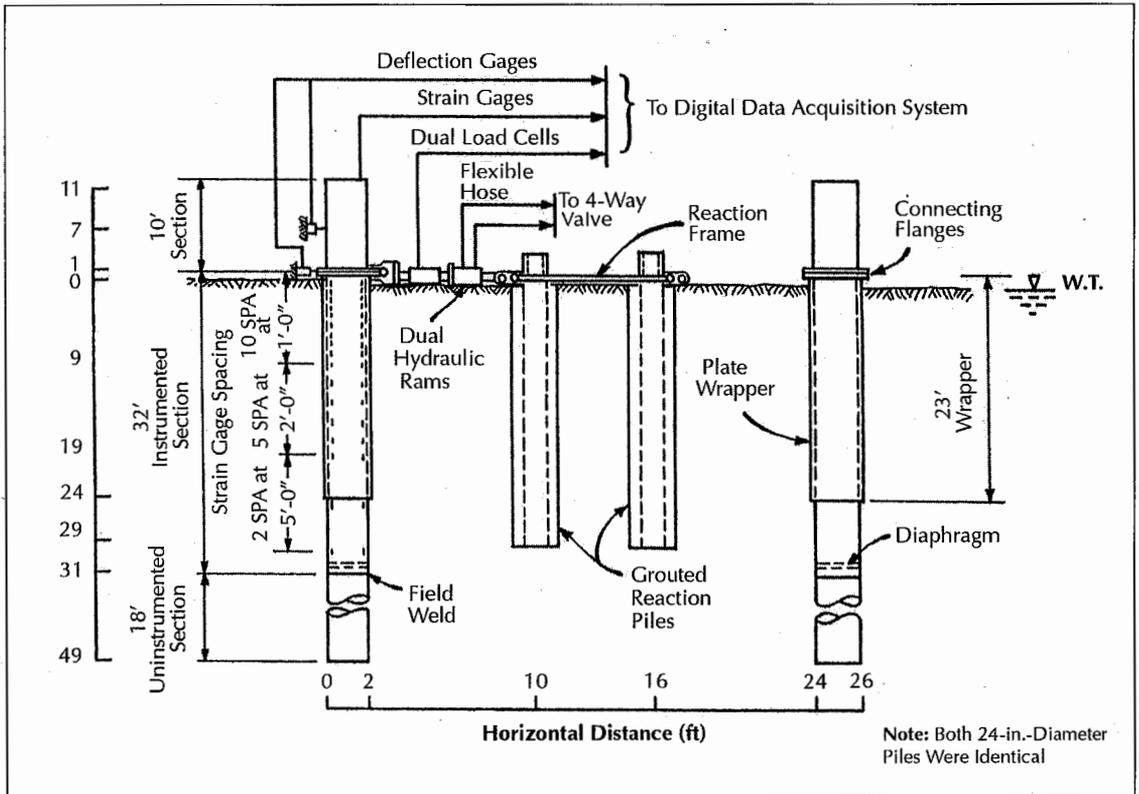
The setup for testing 24-inch-diameter pipe piles under lateral loading.
